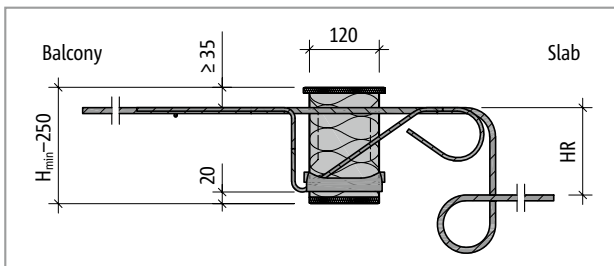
Schöck Isokorb® XT type K-BH: Product section
